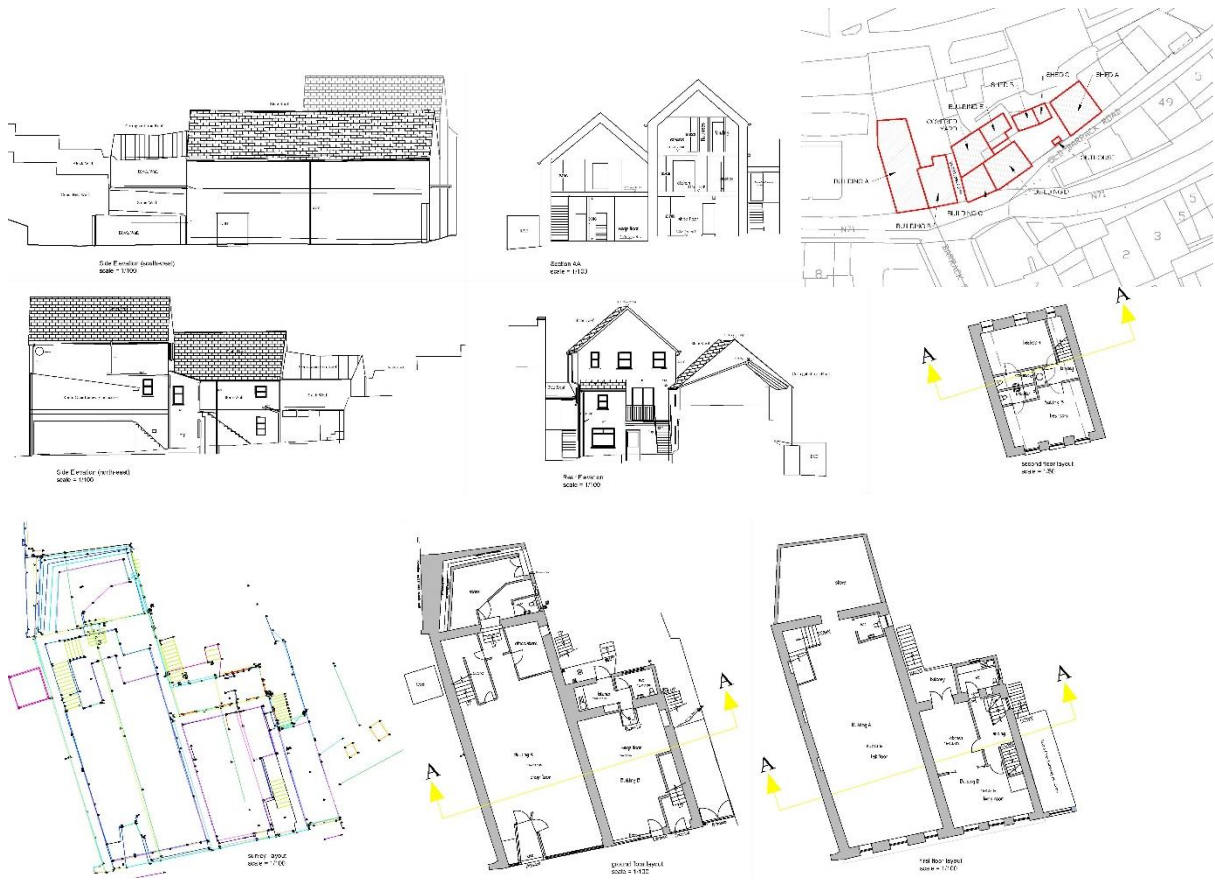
Existing plans, elevations, and sections of Building A and B, Cork County Council (2023)
